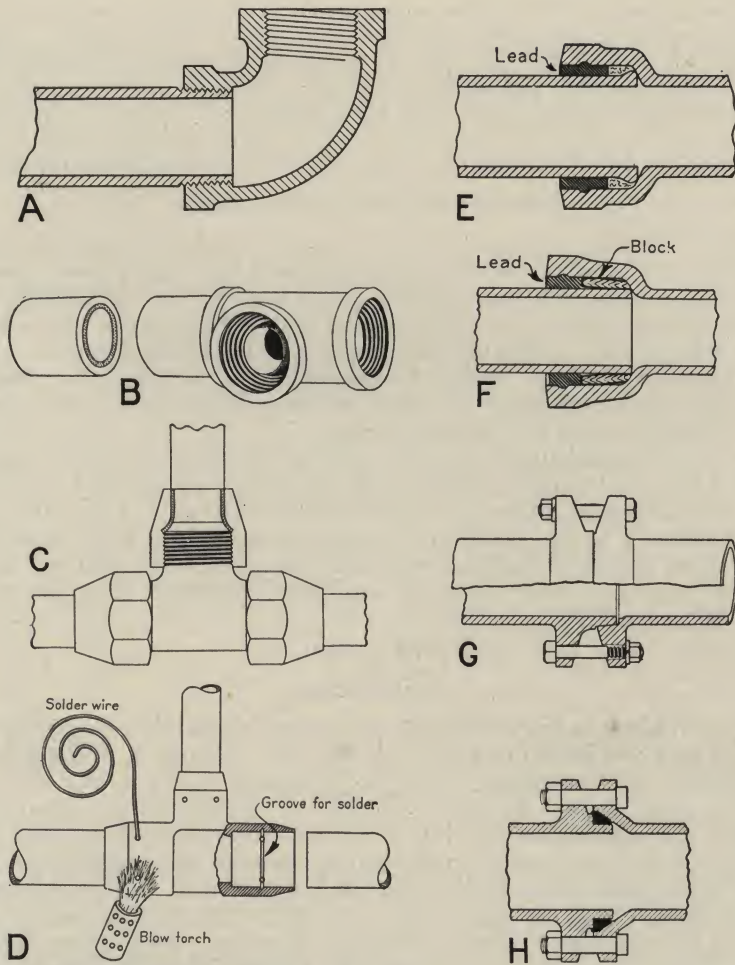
Water pipes and typical joints: A, standard wrought pipe and elbow; B, cement-lined wrought pipe and lead-lined T-branch; C, copper service tubing and union T-branch; D, copper tubing and threadless T-branch with sweat-solder joints; E, common bell and spigot cast-iron pipe; F, bell and spigot pipe prepared for top calking in the trench; G, cast-iron pipe and machined bolted joint; H, cast-iron pipe and bolted joint with rubber-ring gasket.
